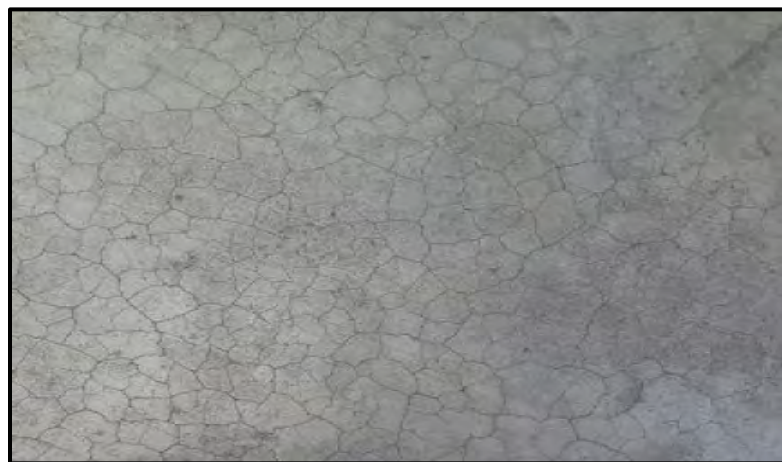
Hairline Cracks (NON-Structural Cracks)³¹.
